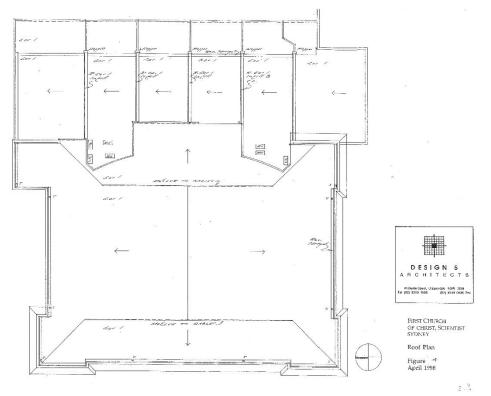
Roof Physical Survey (Source: Conservation Plan, Design 5 – Architects, 1999)
